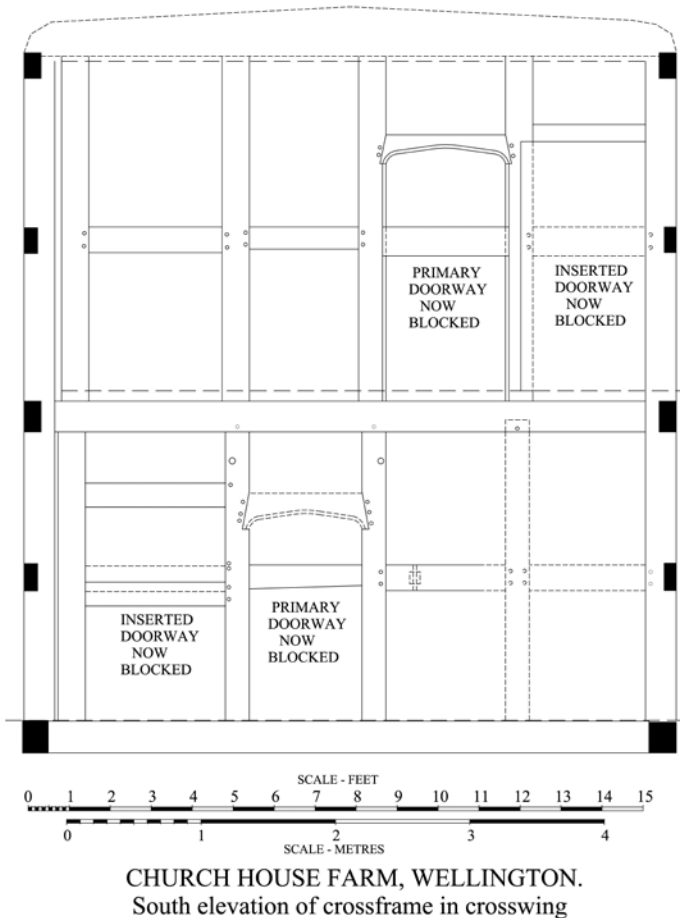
Church House Farm, Wellington. South elevation of the crossframe in the crosswing.
